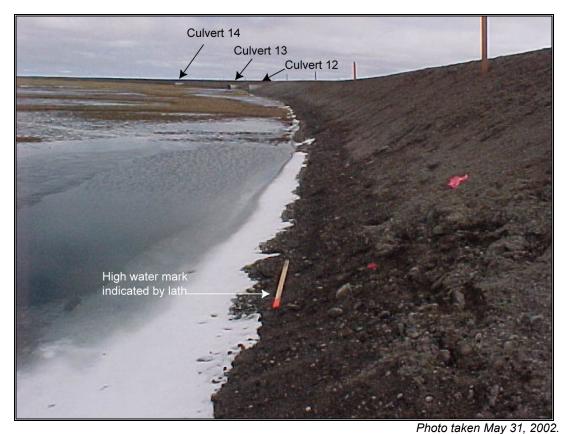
Facing east from Culvert 11 along the north side of the CD-2 access road.
